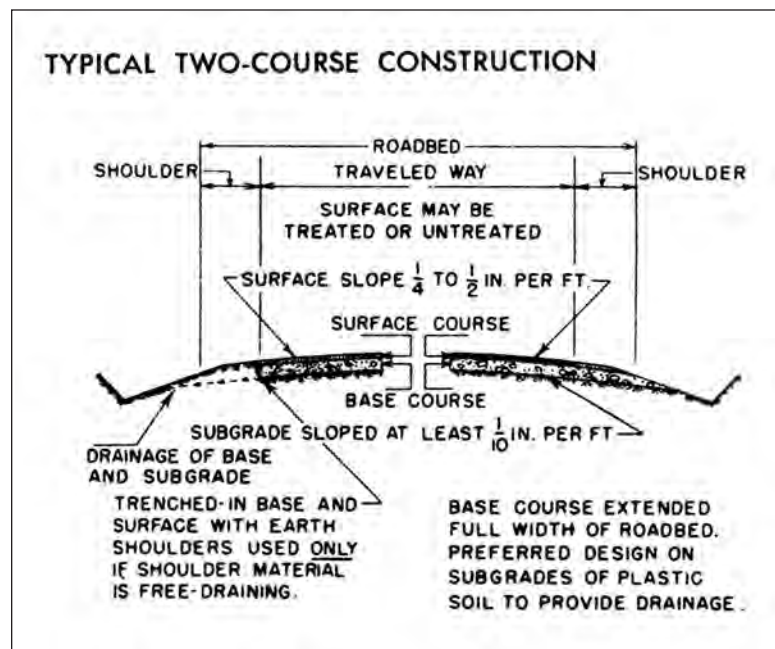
Typical cross section of a two-course road. From War Department 1947:134.
